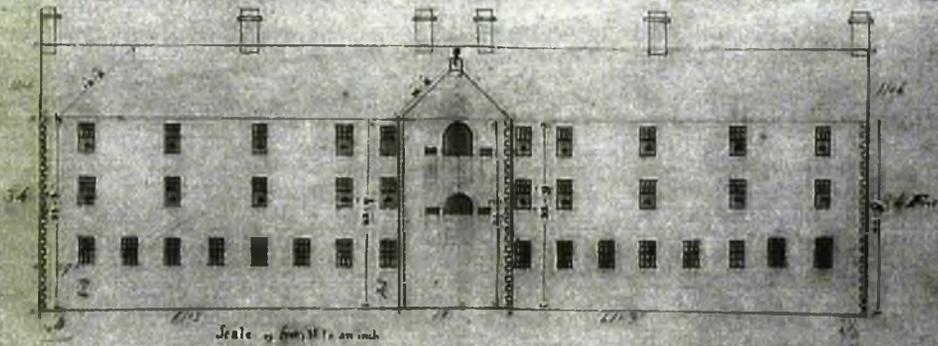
United College. Elevations of south side of north building and east side of west building, survey drawing No.5. R. Reid, probably drawn in 1825.
